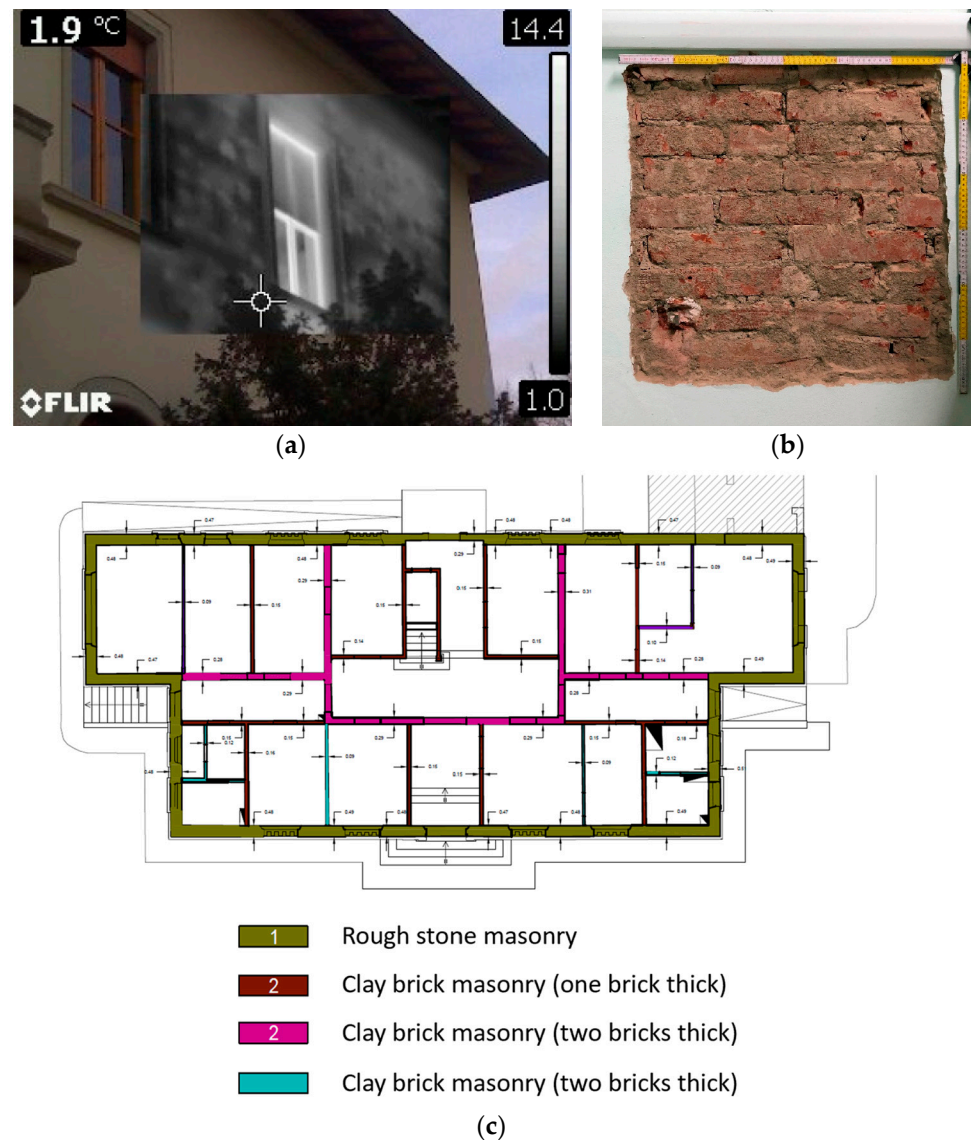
(a) Thermography investigations; (b) test holes on a clay masonry wall; (c) structural characterization of masonry walls.
